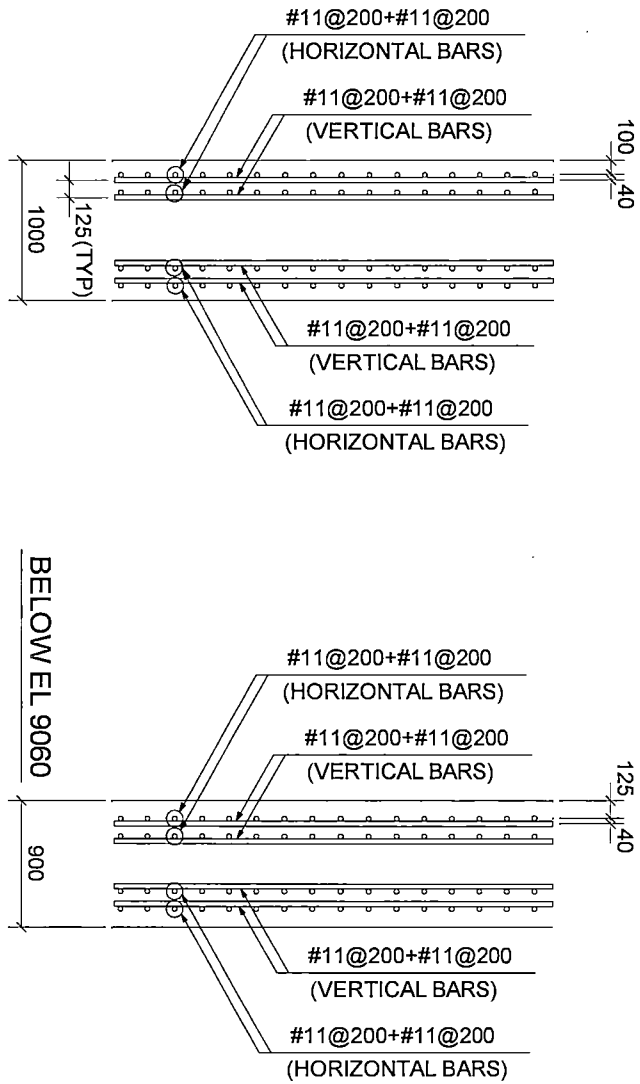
Assumed Walls Rebar Arrangement (unit: mm)
